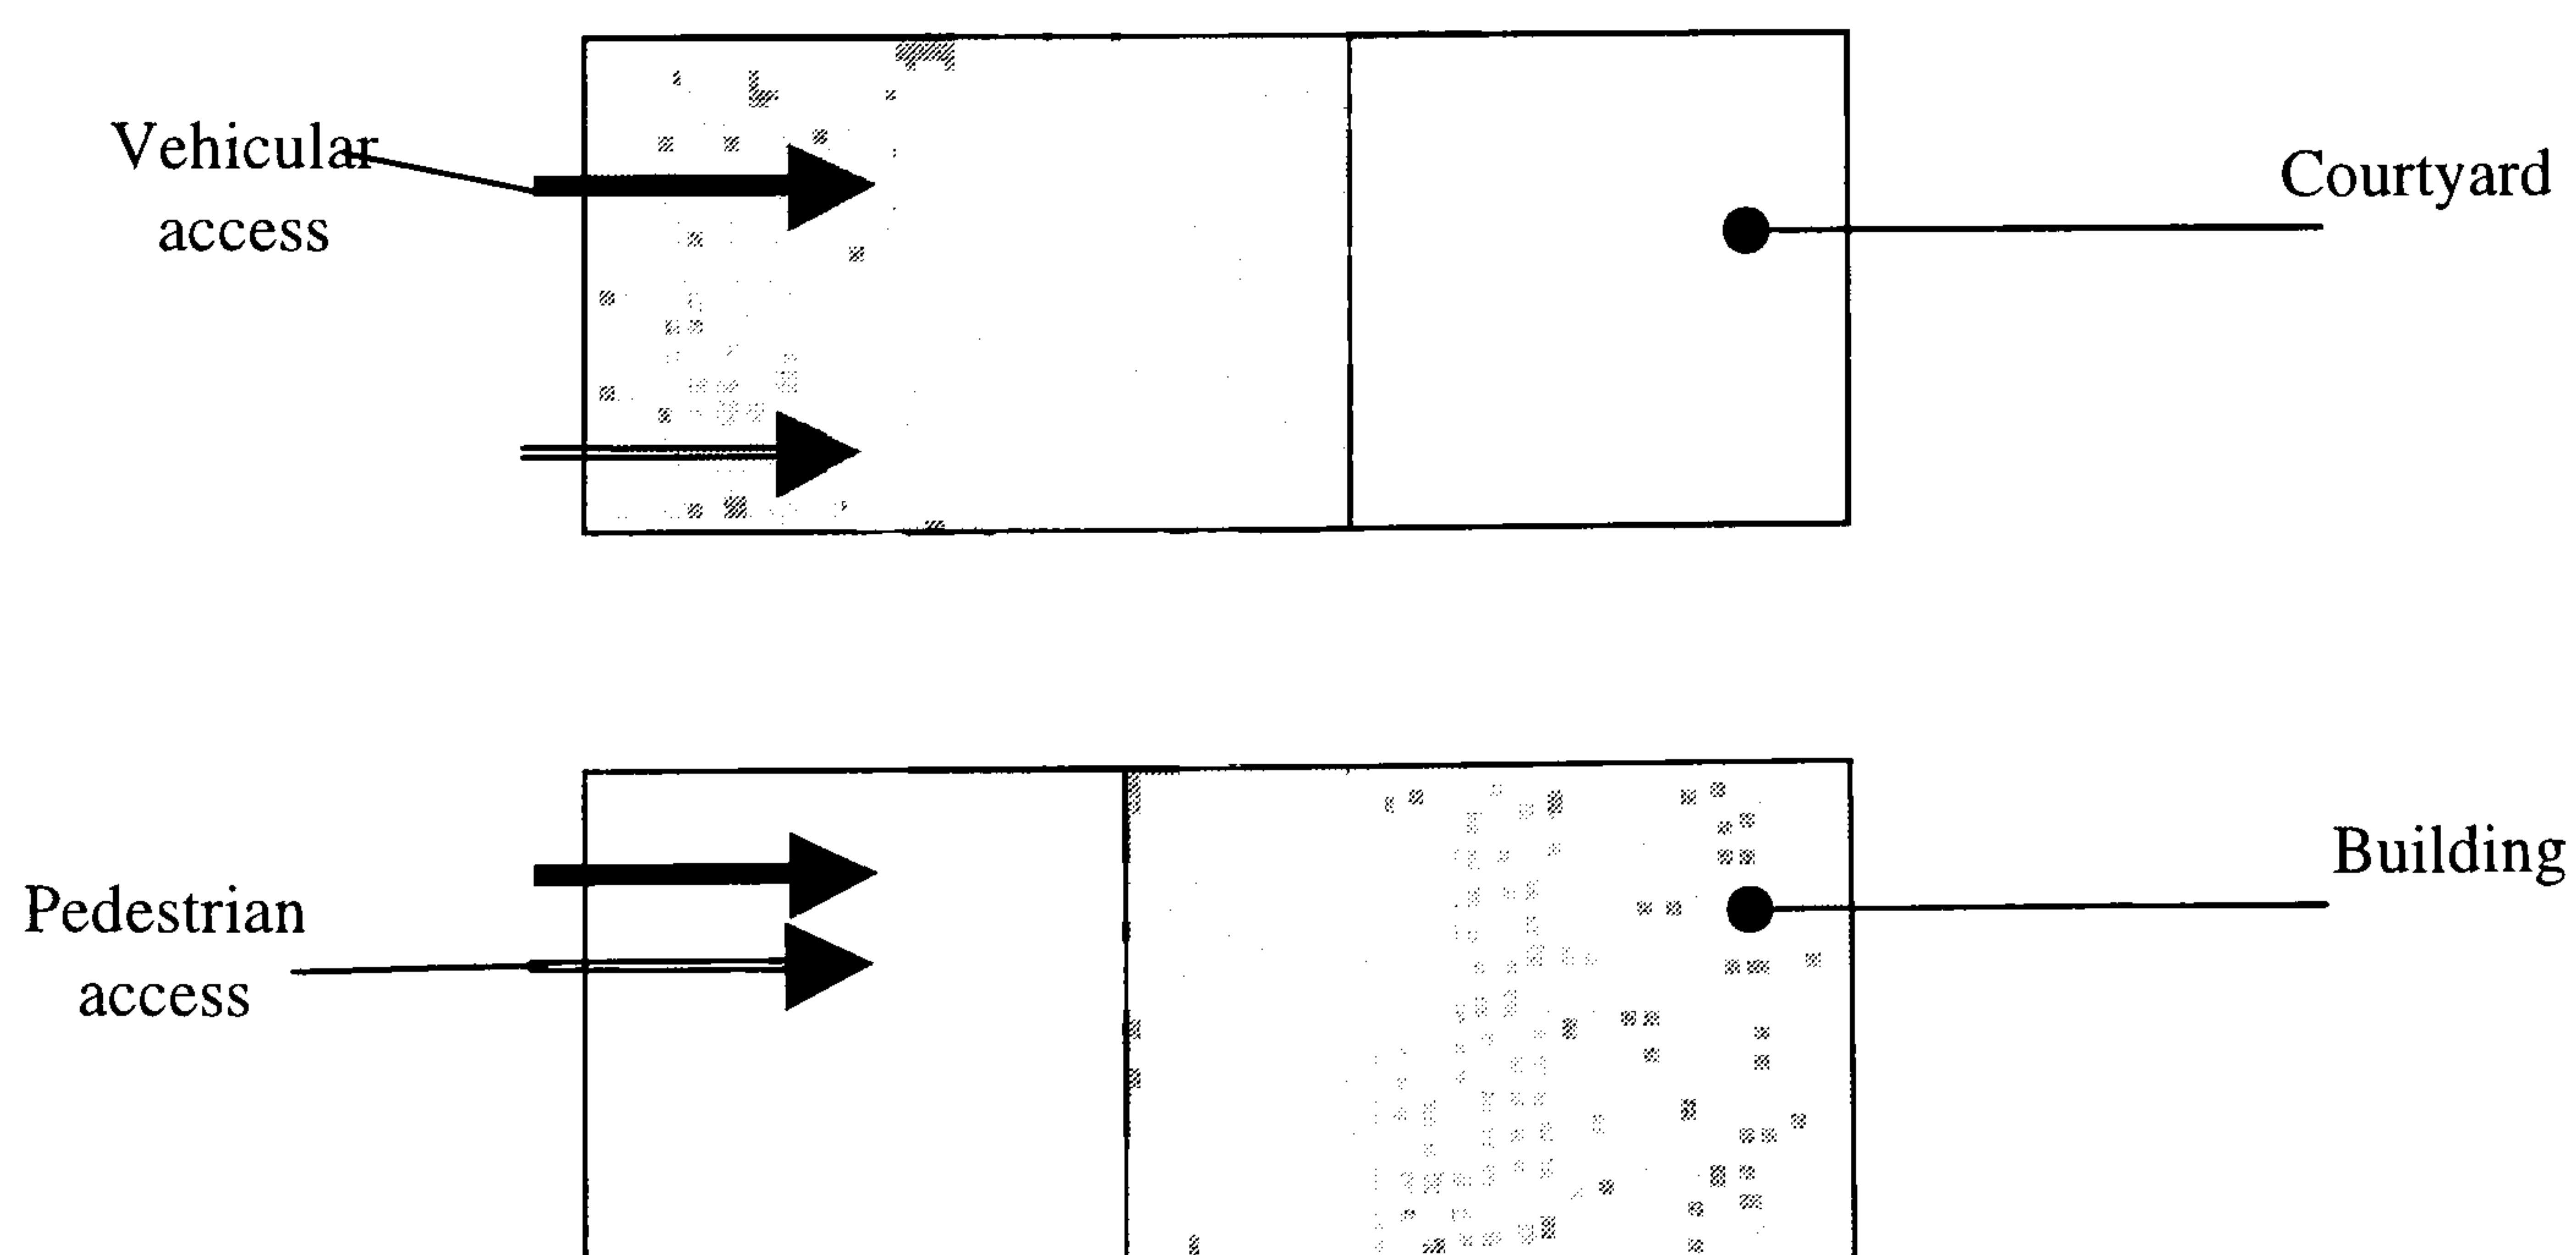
TYPICAL ACCESS SYSTEM TO THE DWELLING UNITS IN THE AREA.
